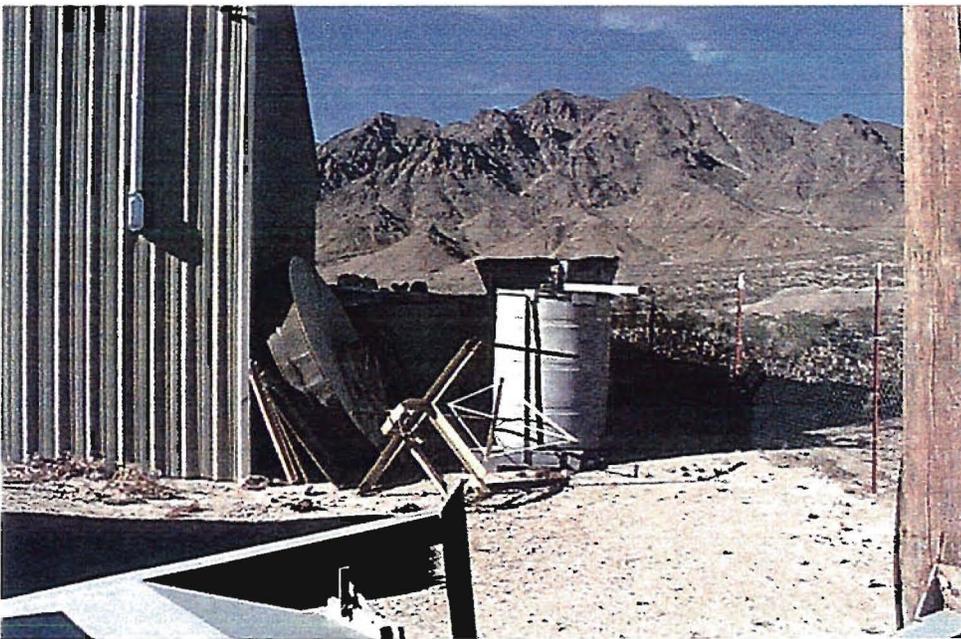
Taken by E. Seum 1/10/2000. Looking along the north end of the mill building. Shows items accumulating, compare to photos 8, 30.
